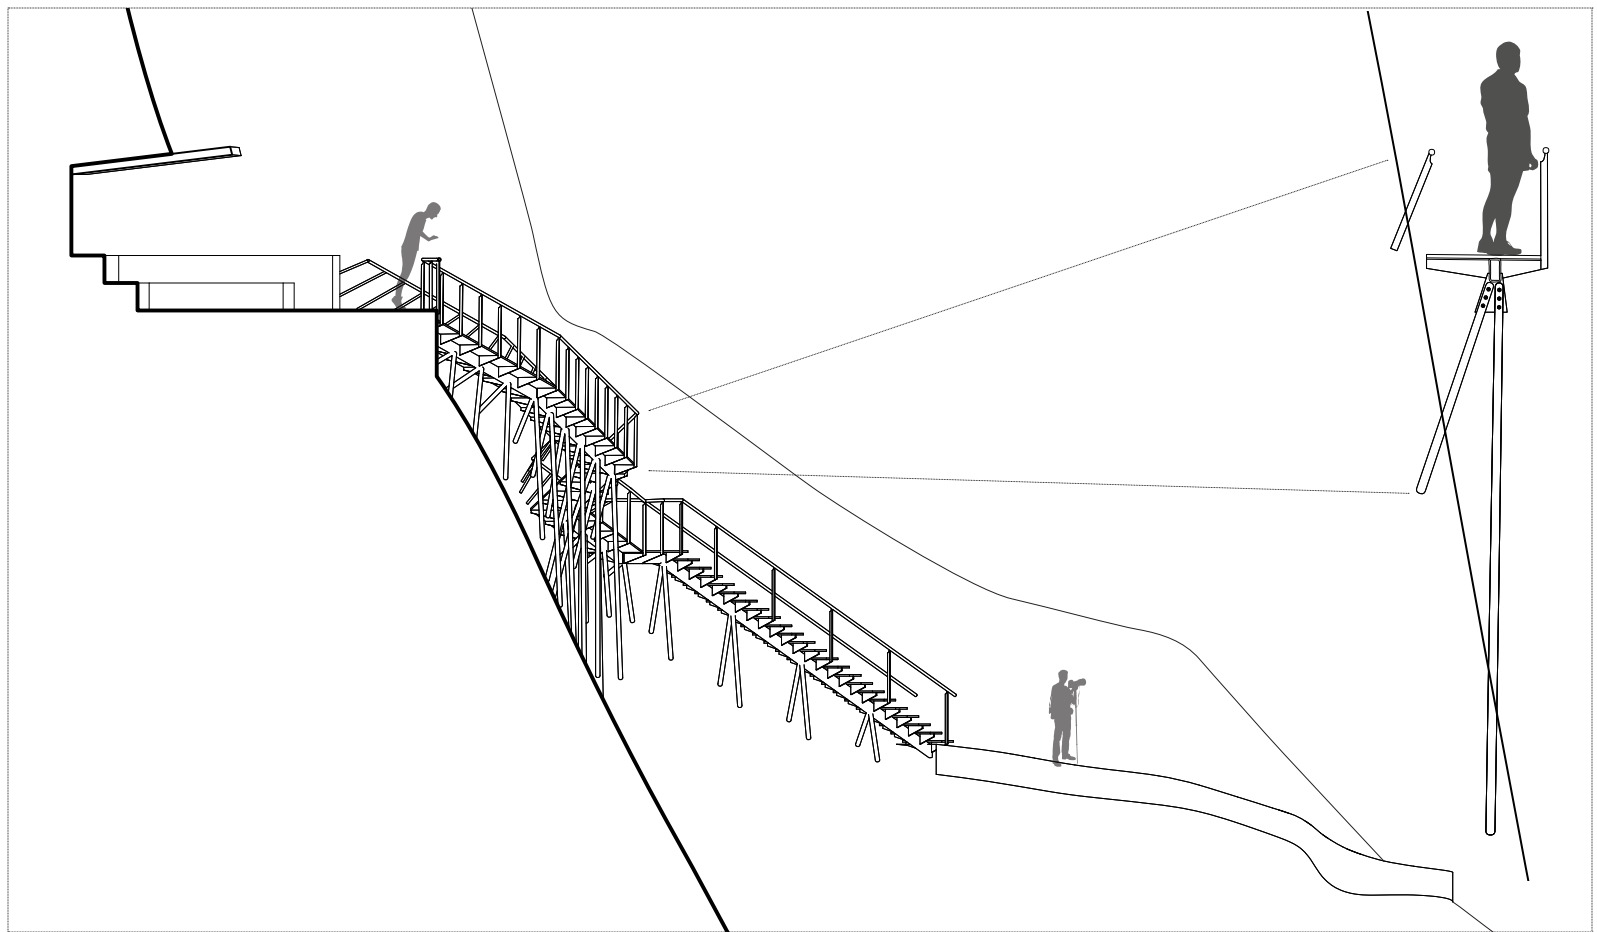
Section – Kleivodden: Cave and cliff bridge. Inset: Detail - Cliff bridge transverse section.
